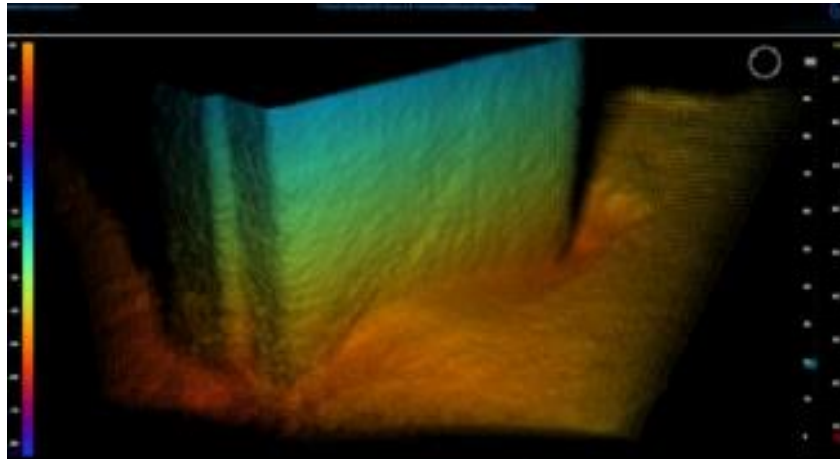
Main St. Bridge South Pier close up - depicting shoaling, visual marks
